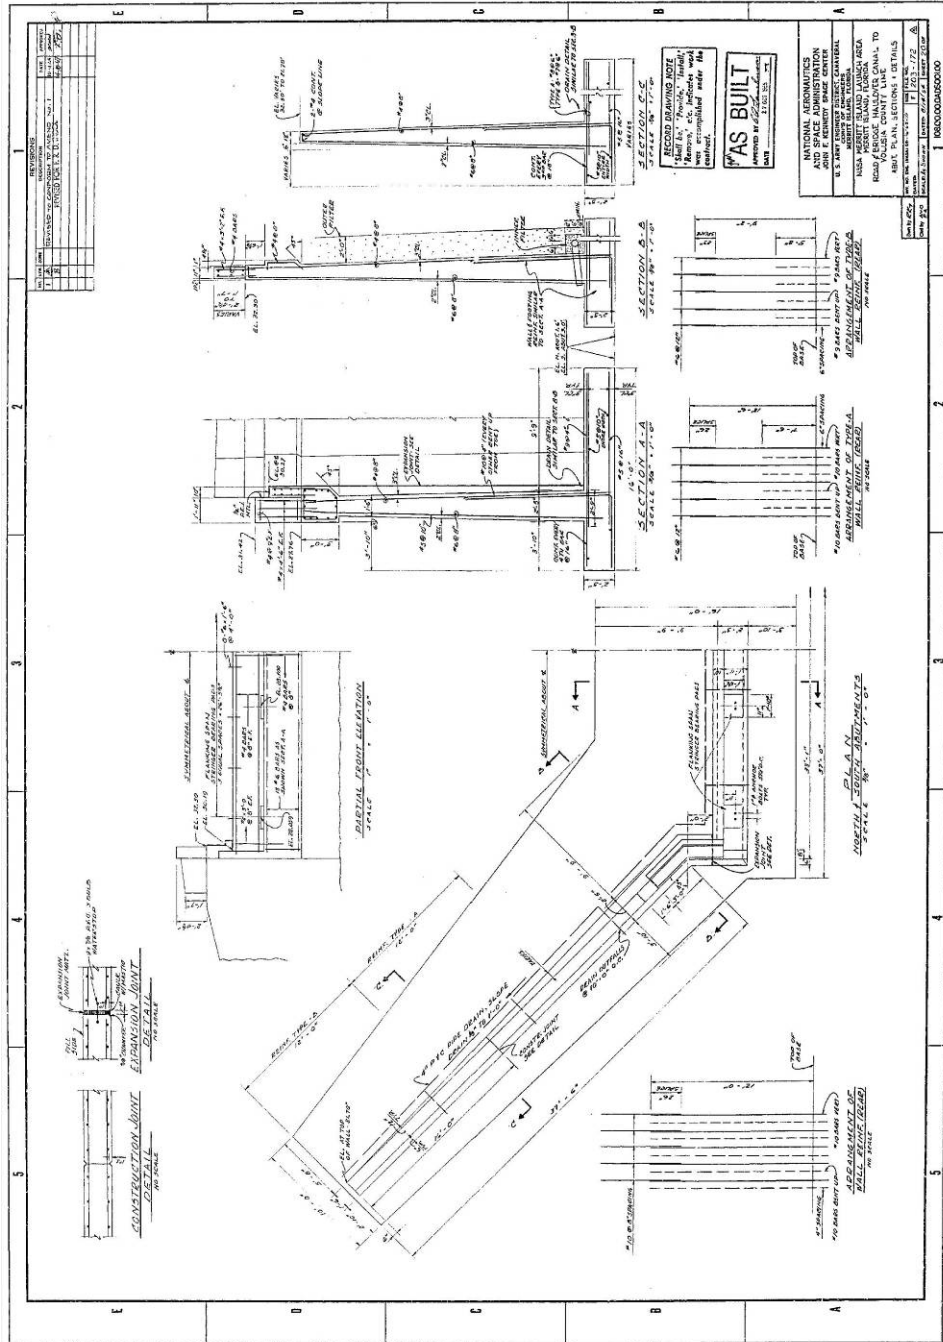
U.S. ACOE, "Plans of Proposed Road and Bridge Haulover Canal (to Volusia County Line)," Abut. Plan, Sections & Details, August 1964, Sheet 20.
